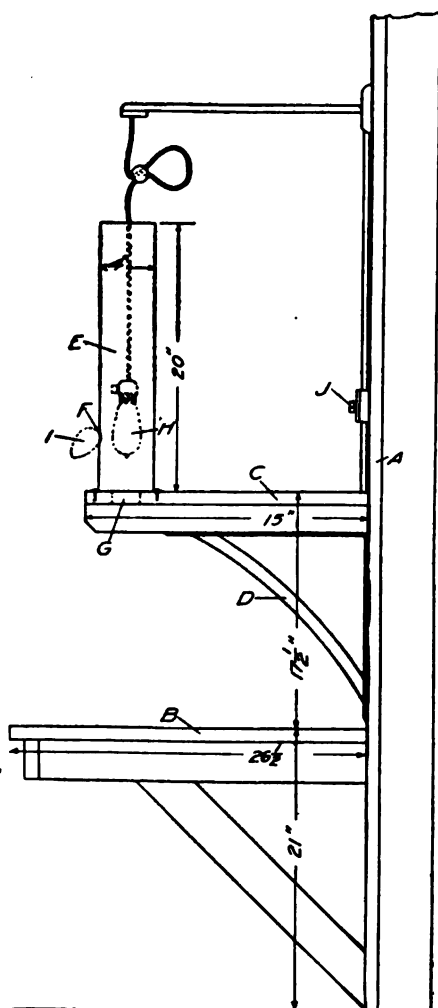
PLAN OF EGG CANDLING ROOM SHOWING BENCH, SHELF, AND CANDLER
